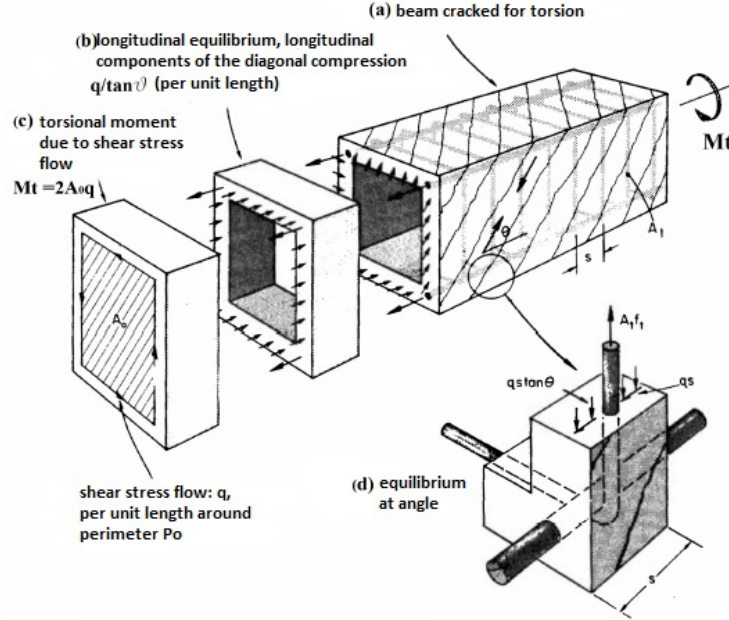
Torsional model for reinforced concrete beams with transverse reinforcement
